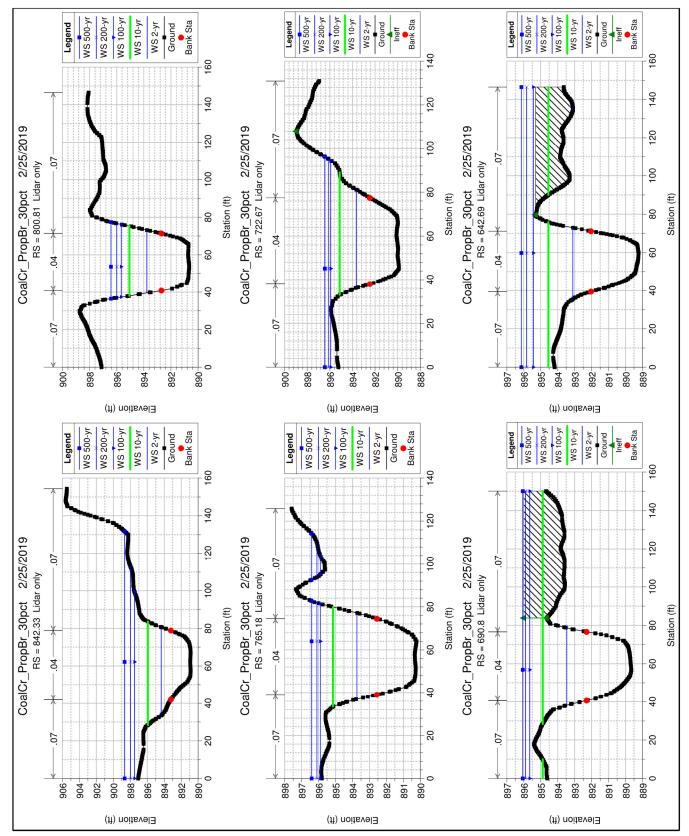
HEC-RAS Coal Creek hydraulic model cross sections for proposed bridge #3035A.
